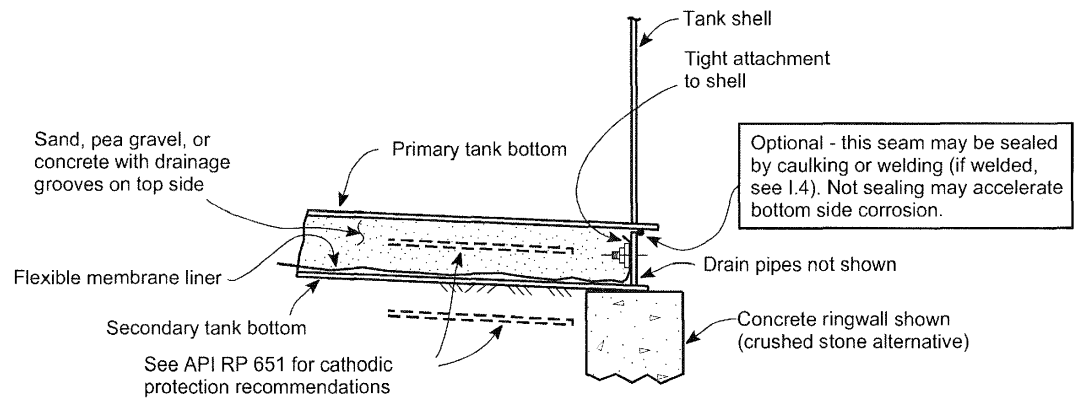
Double Steel Bottom with Leak Detection at the Tank Perimeter (Typical Arrangement)
